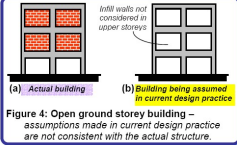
Open ground storey building – assumptions made in current design practice are not consistent with the actual structure.
